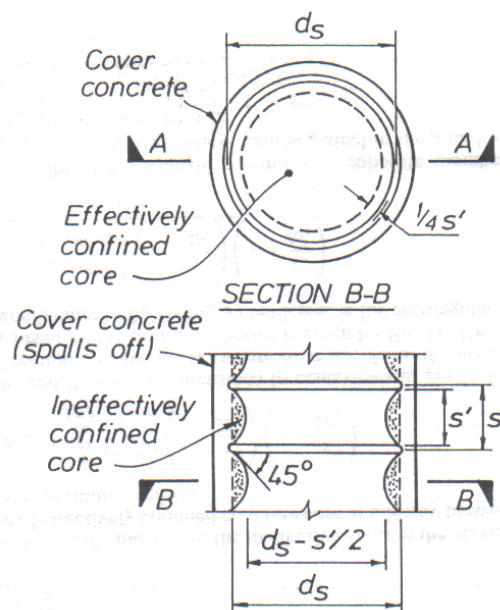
Spalling of Cover Concrete (Mander et. al. 1988).
